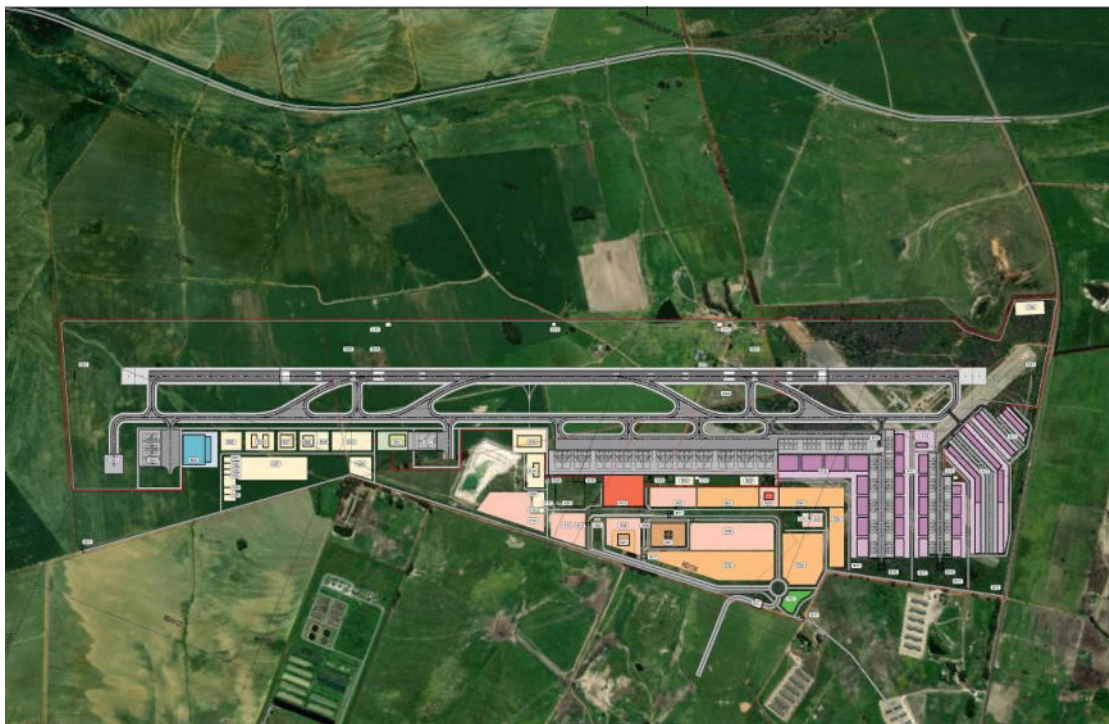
The proposed site development plan Picture courtesy PHS Consulting
